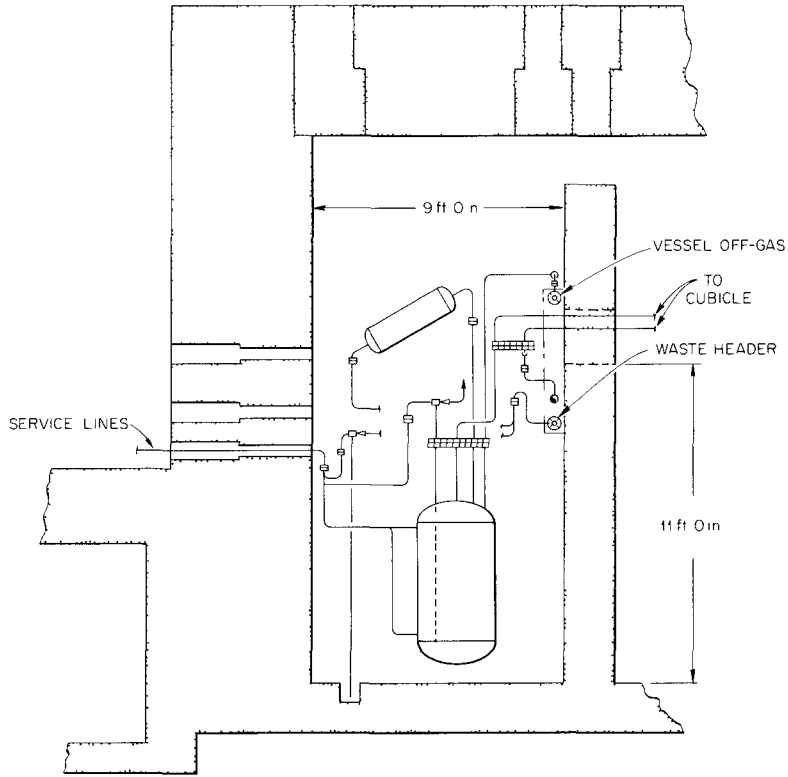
Typical Tank Pit Piping Layout, Elevation.
